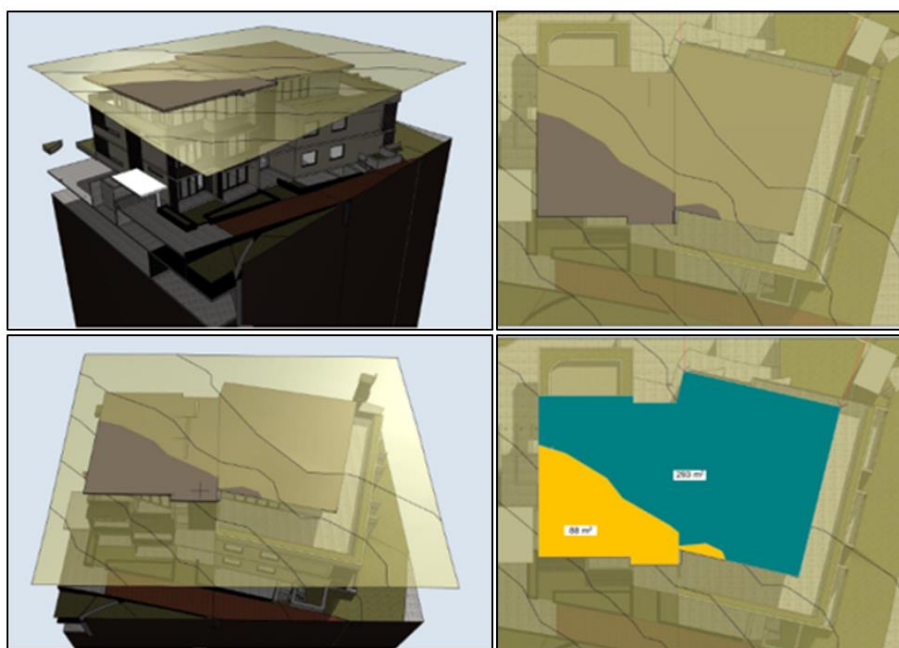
Height Plane of Building B showing extent of non-compliance (as per Plan DA10HP Issue C)
